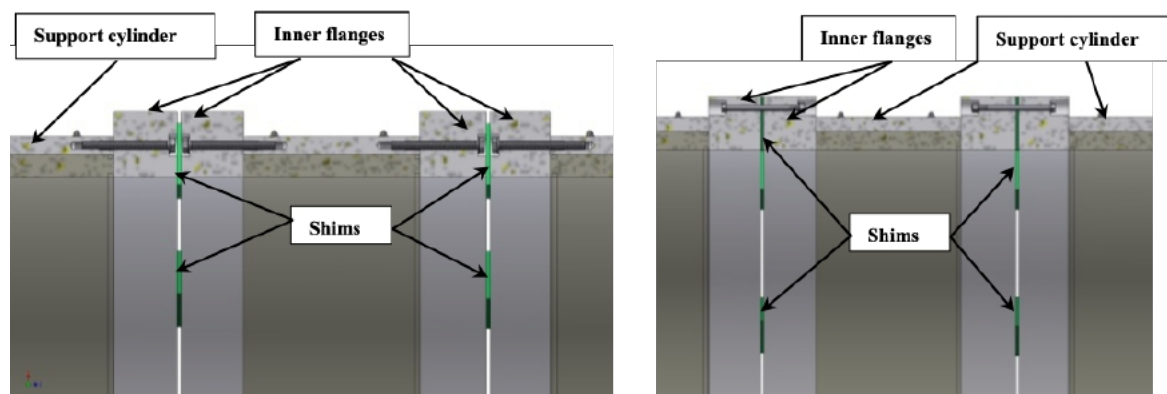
Connections "inner flanges – support cylinder" (left) and "inner flange – inner flange" (right).
